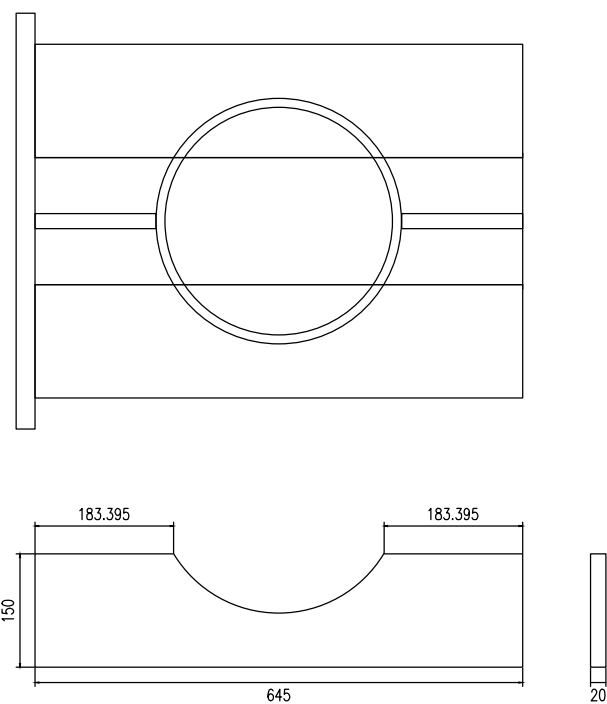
DETAILED DRAWING OF CROSS BEAM STIFFENERS
